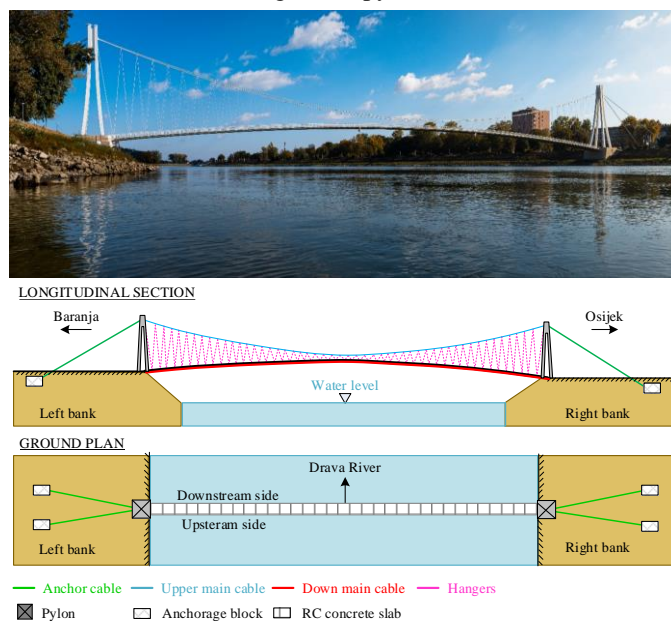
a) View on the bridge from the right bank b) Longitudinal section and the ground plane of the bridge
